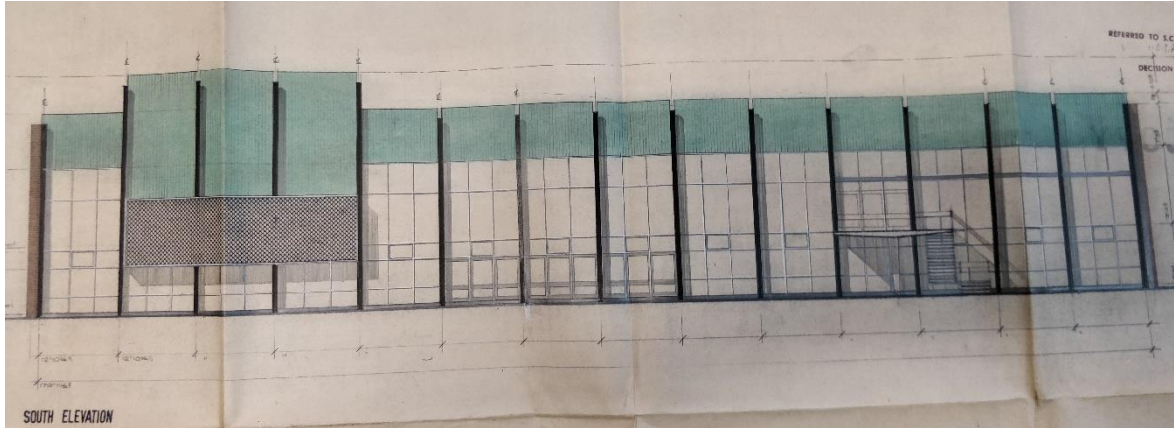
The South Elevation of the Richmond Public Baths. (Source: Gooday, 1963)
